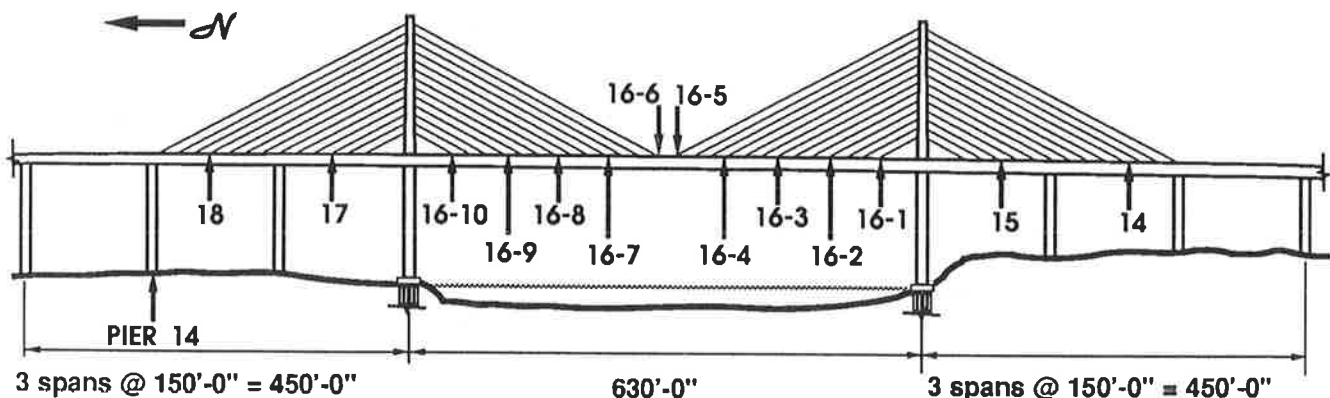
ELEVATION VIEW OF THE I-295 BRIDGE SHOWING LONGITUDINAL LOCATIONS OF TEST VEHICLE
